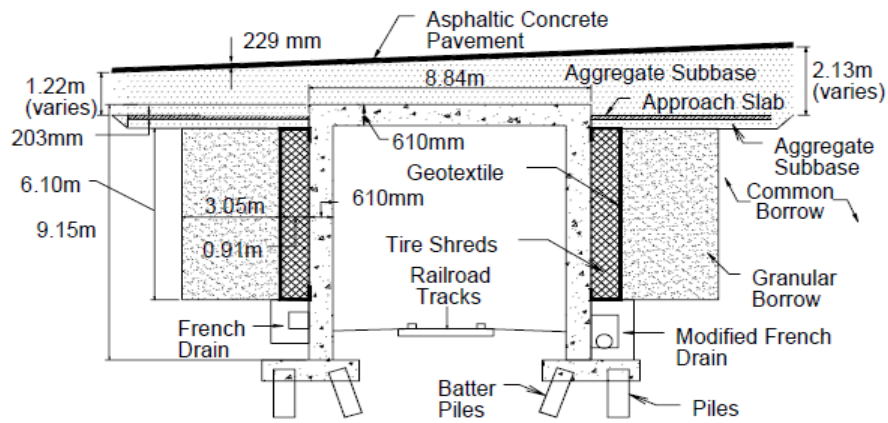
Tyre Shreds as Compressible Backfill for Rigid Frame Bridge
